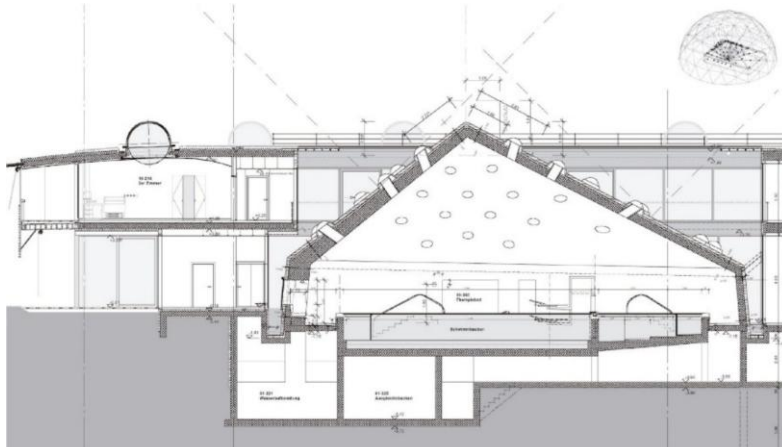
Section of Swimming Pool (Source: Arquitectura Viva)
